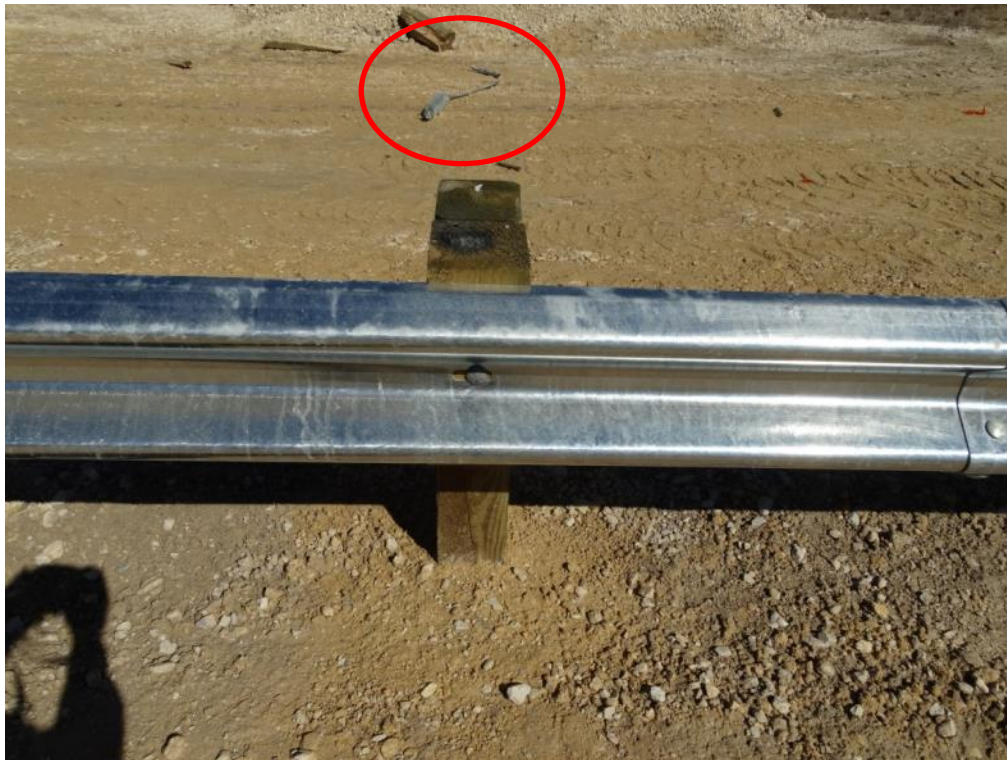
Post Test Location of Anchor Cable on Non-Traffic Side Even with Post 10
